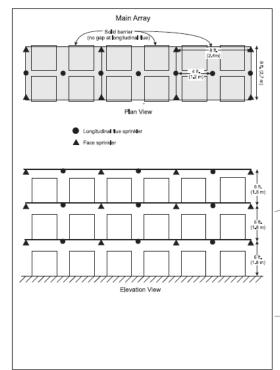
Double row rack sprinkler layout - fire protection scheme D
